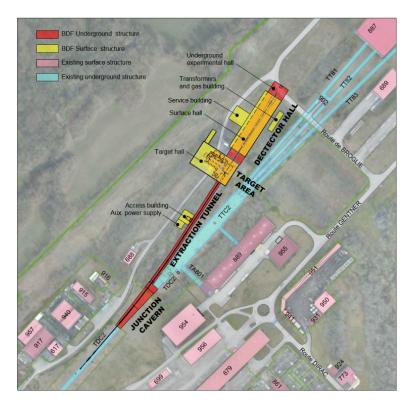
Plan view of the BDF extraction tunnel, target complex and detector hall next to the existing SPS "North Area" (North Area shown in blue).
